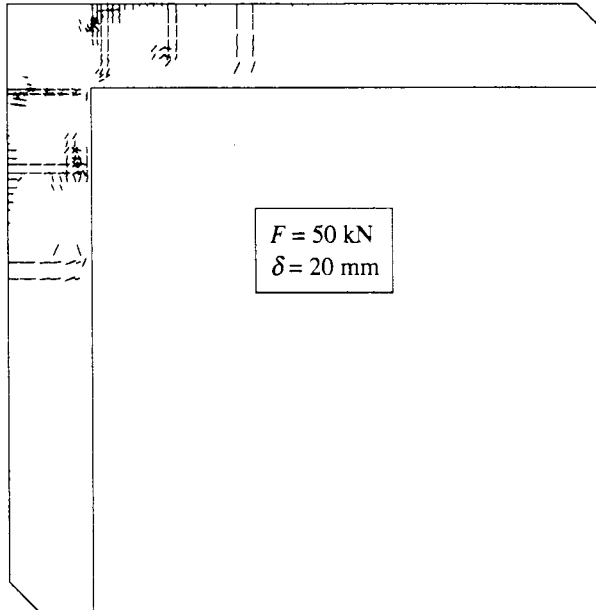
Crack pattern at the end of the analysis for a frame corner with the conventional reinforcement detailing when assuming "other" bond condition.
